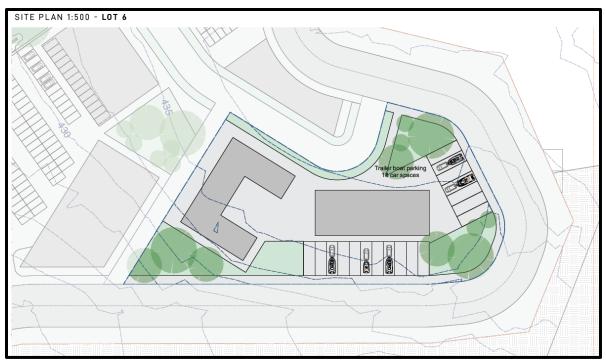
Lot 6 of the Mixed–Use Precincts Site Plan (Source: Robert Harwood Architects)
